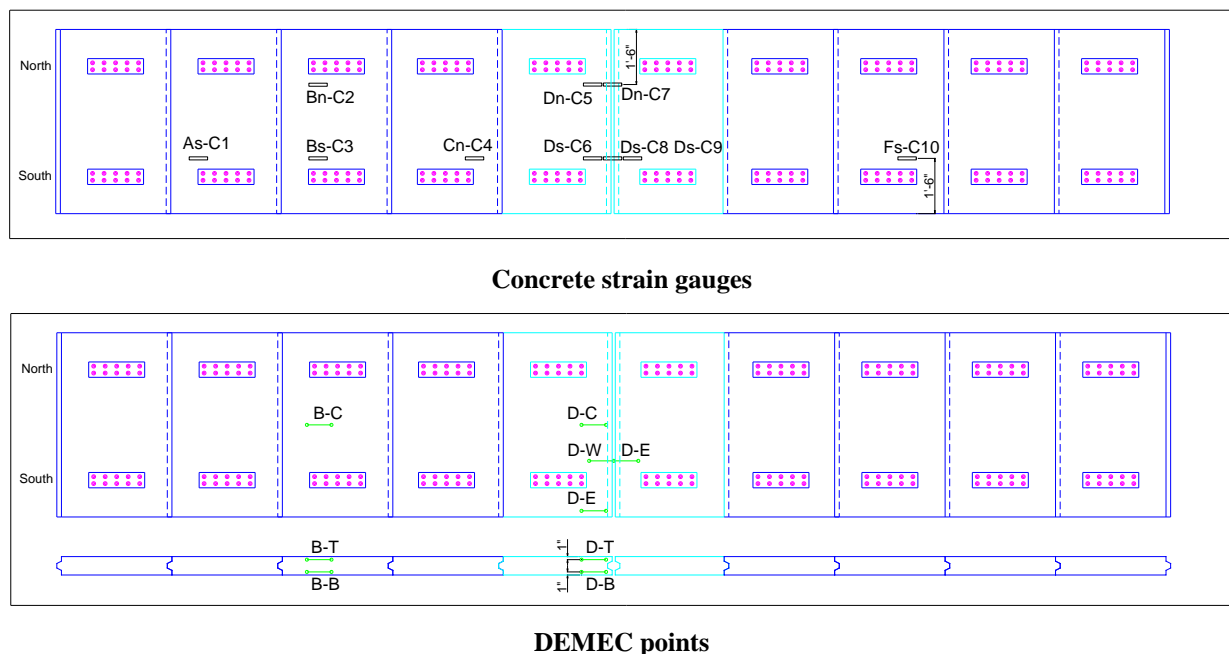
Concrete strain gauges and DEMEC points installed on the deck.
